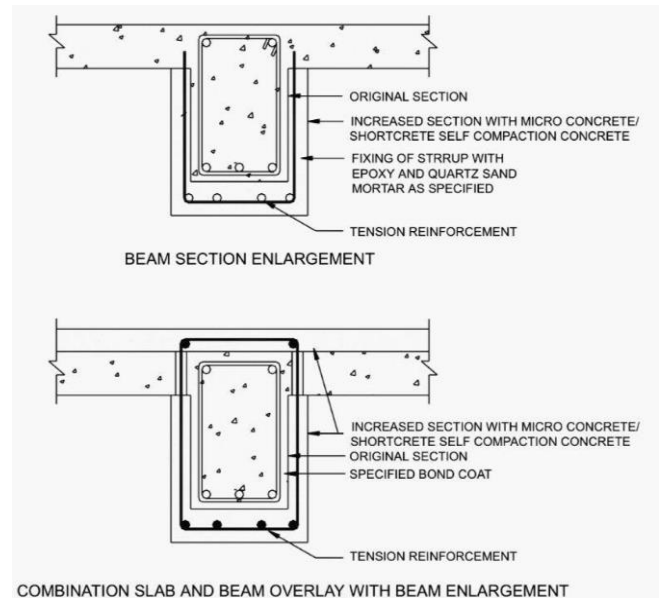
Combination Slab and Beam Overlay With Beam Enlargement.
